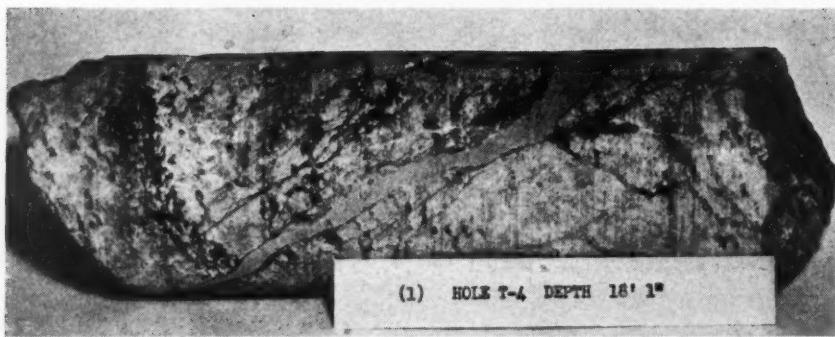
TYPICAL ROCK CORE taken after grouting shows cement penetration in thin seam. Foundation was so efficiently solidified by grouting using compressed air that dowel holes drilled later would take but little grout.
